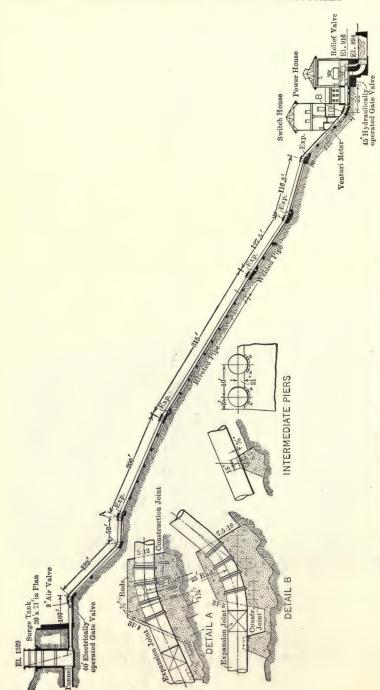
Penstock Showing Location of Expansion Joints and Method of Anchoring. Georgia Railway, Light and Power Company.
